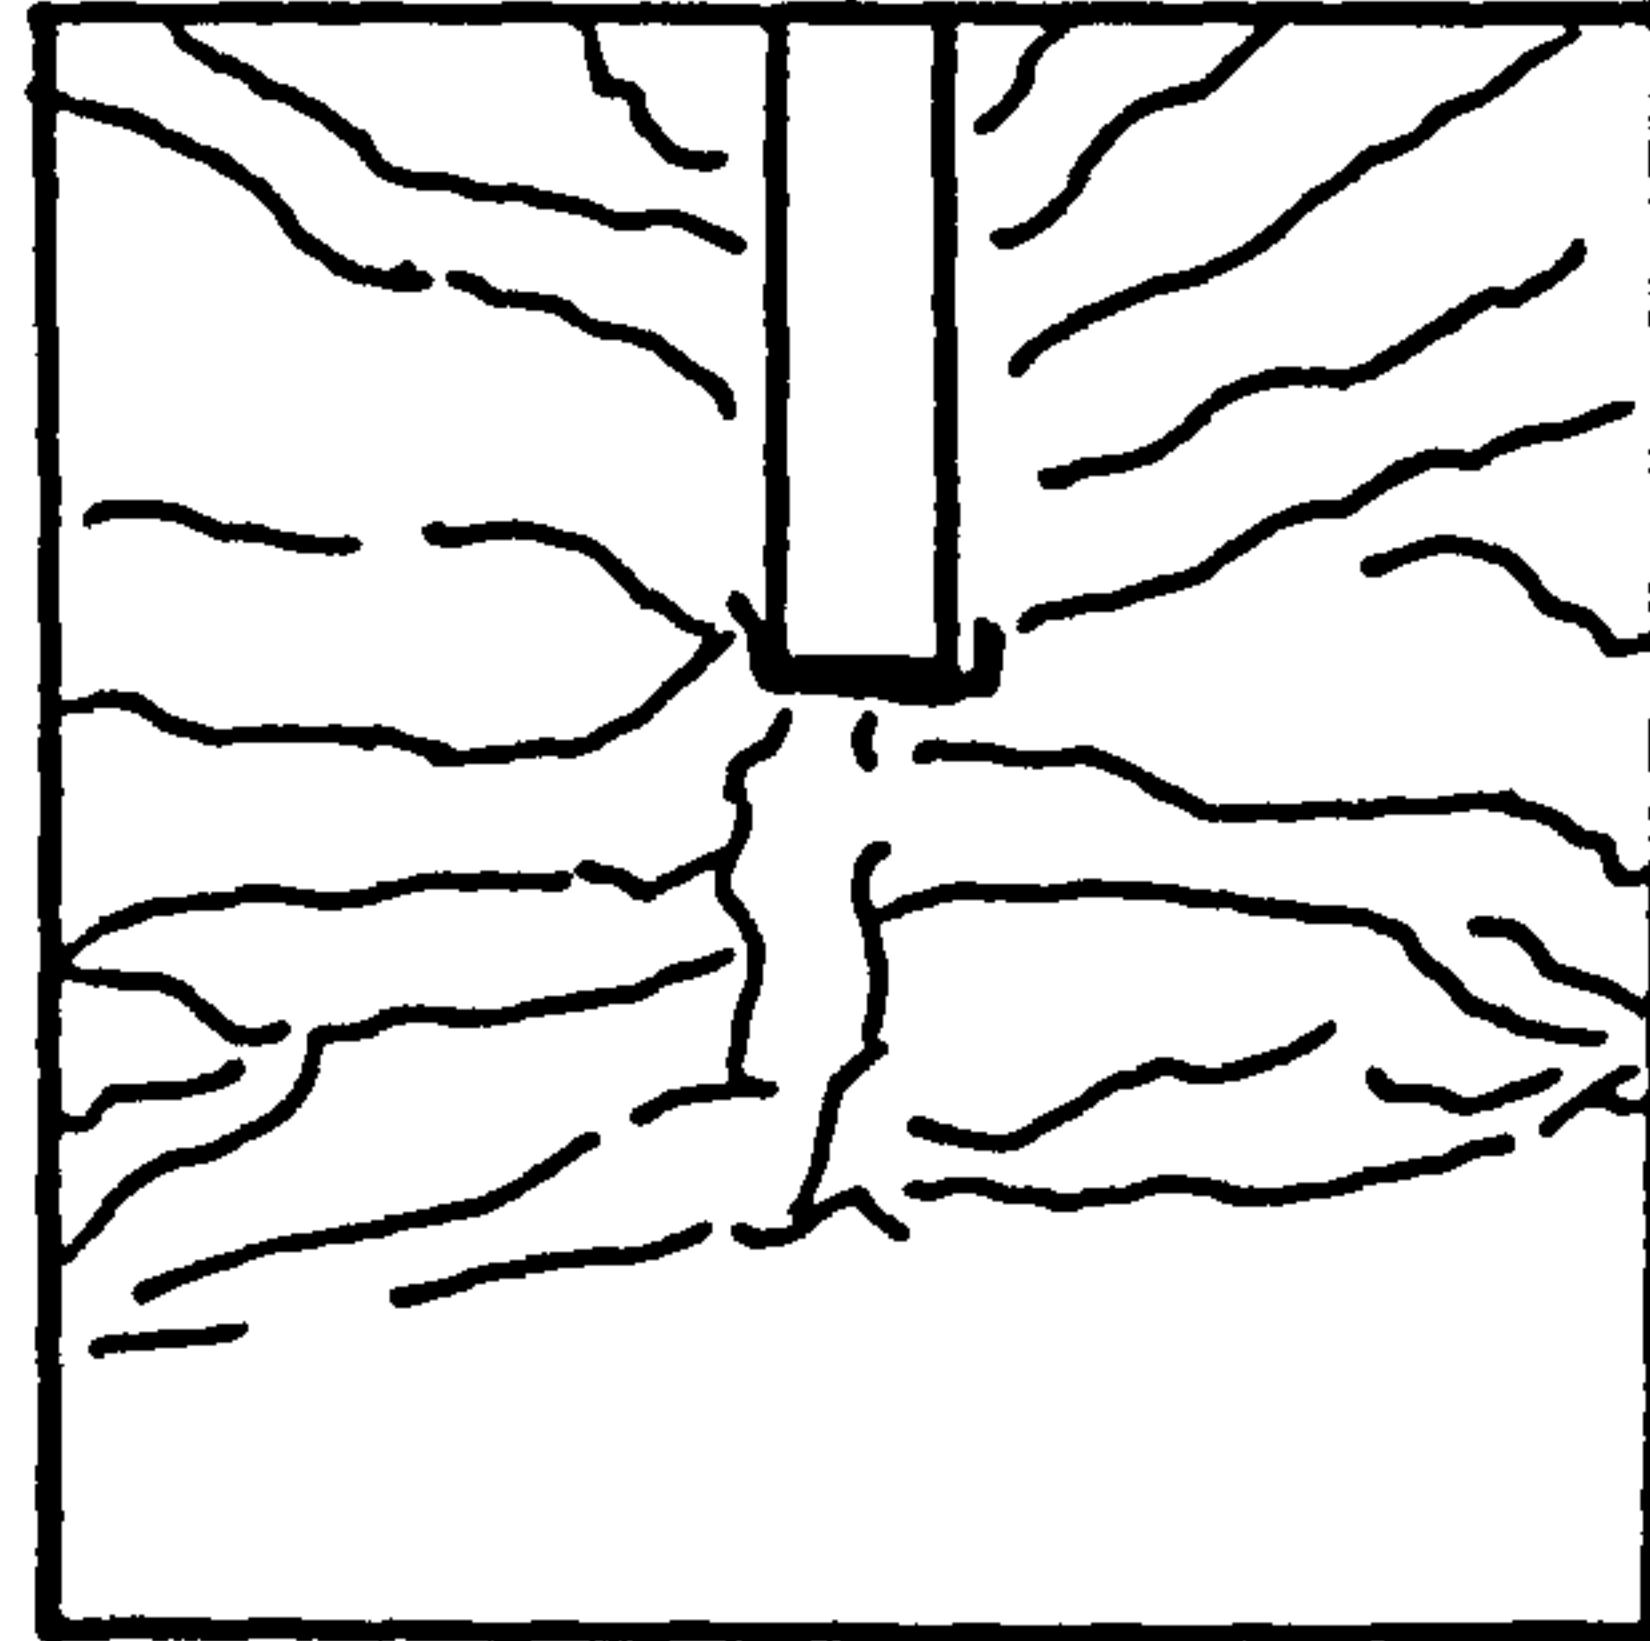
Crack pattern of the slab of PT2 just before failure.
